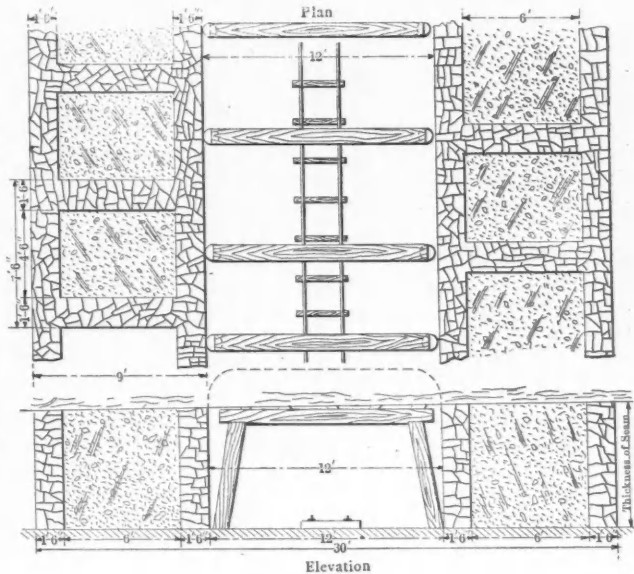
DETAILS OF SHELL WALLS USED TO PROTECT GATEWAYS
